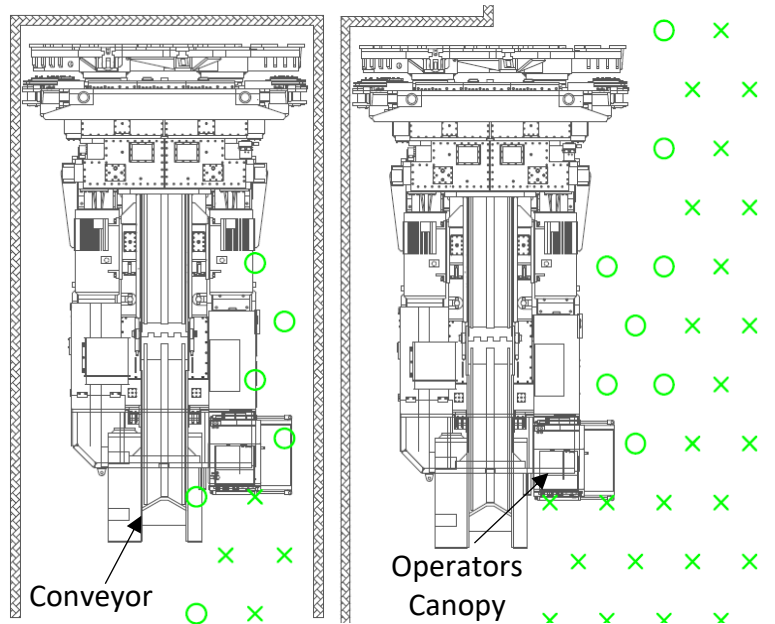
Bolt installation locations for a machine bolting the right side of the conveyor only. O's indicated locations where bolts may be possible while X's denote locations where bolts are expected. Locations shown are for a staggered 1.2-meter by 1.2-meter pattern. Bolts in this scenario are located only on the right side of the conveyor system.
